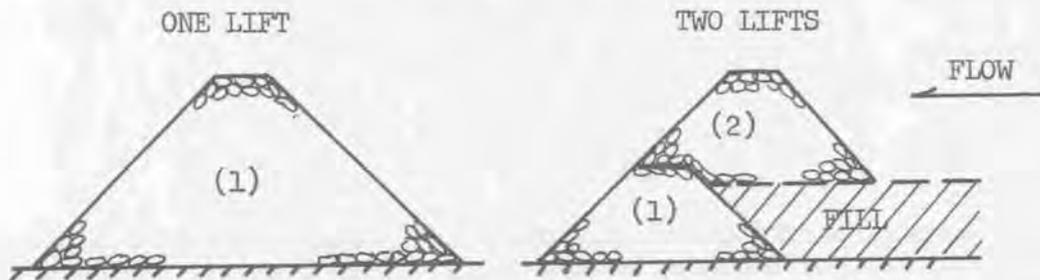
CONSTRUCTION BY LIFTS ON POINT BARS
